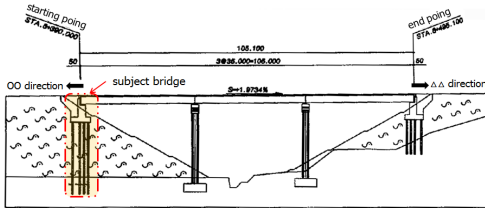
000 Bridge abutment (A2, abutment in OO-OO expressway)
